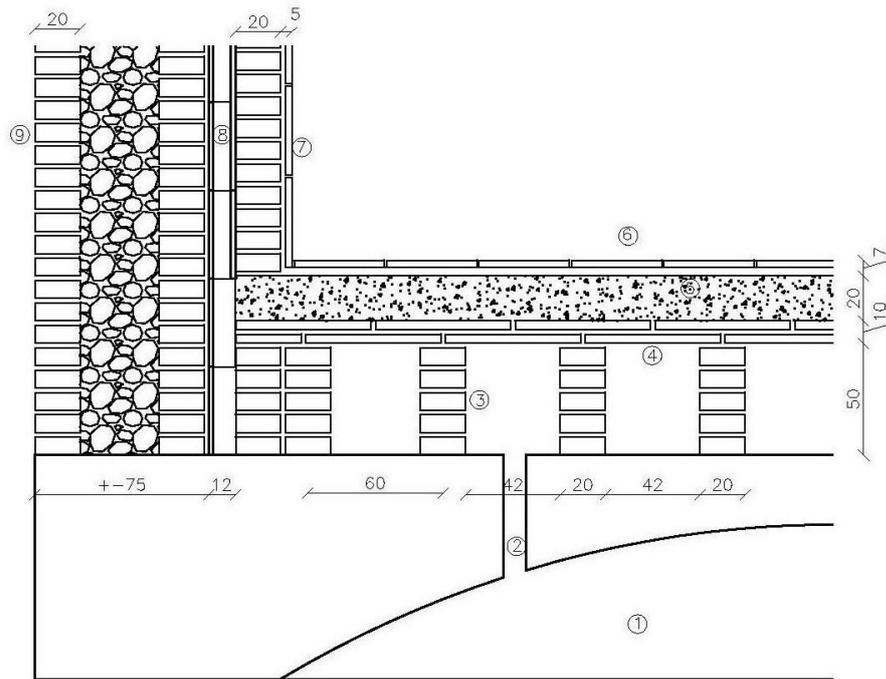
Ideal Building section of the wall and floor of a Roman Thermal Bath. 1-praefurnium or fireplace; 2-chimney; 3-pillars of square-bricks; 4-two-feet-bricks; 5-mortar; 6-floor; 7-interior finish; 8-tubuli; 9-external wall
